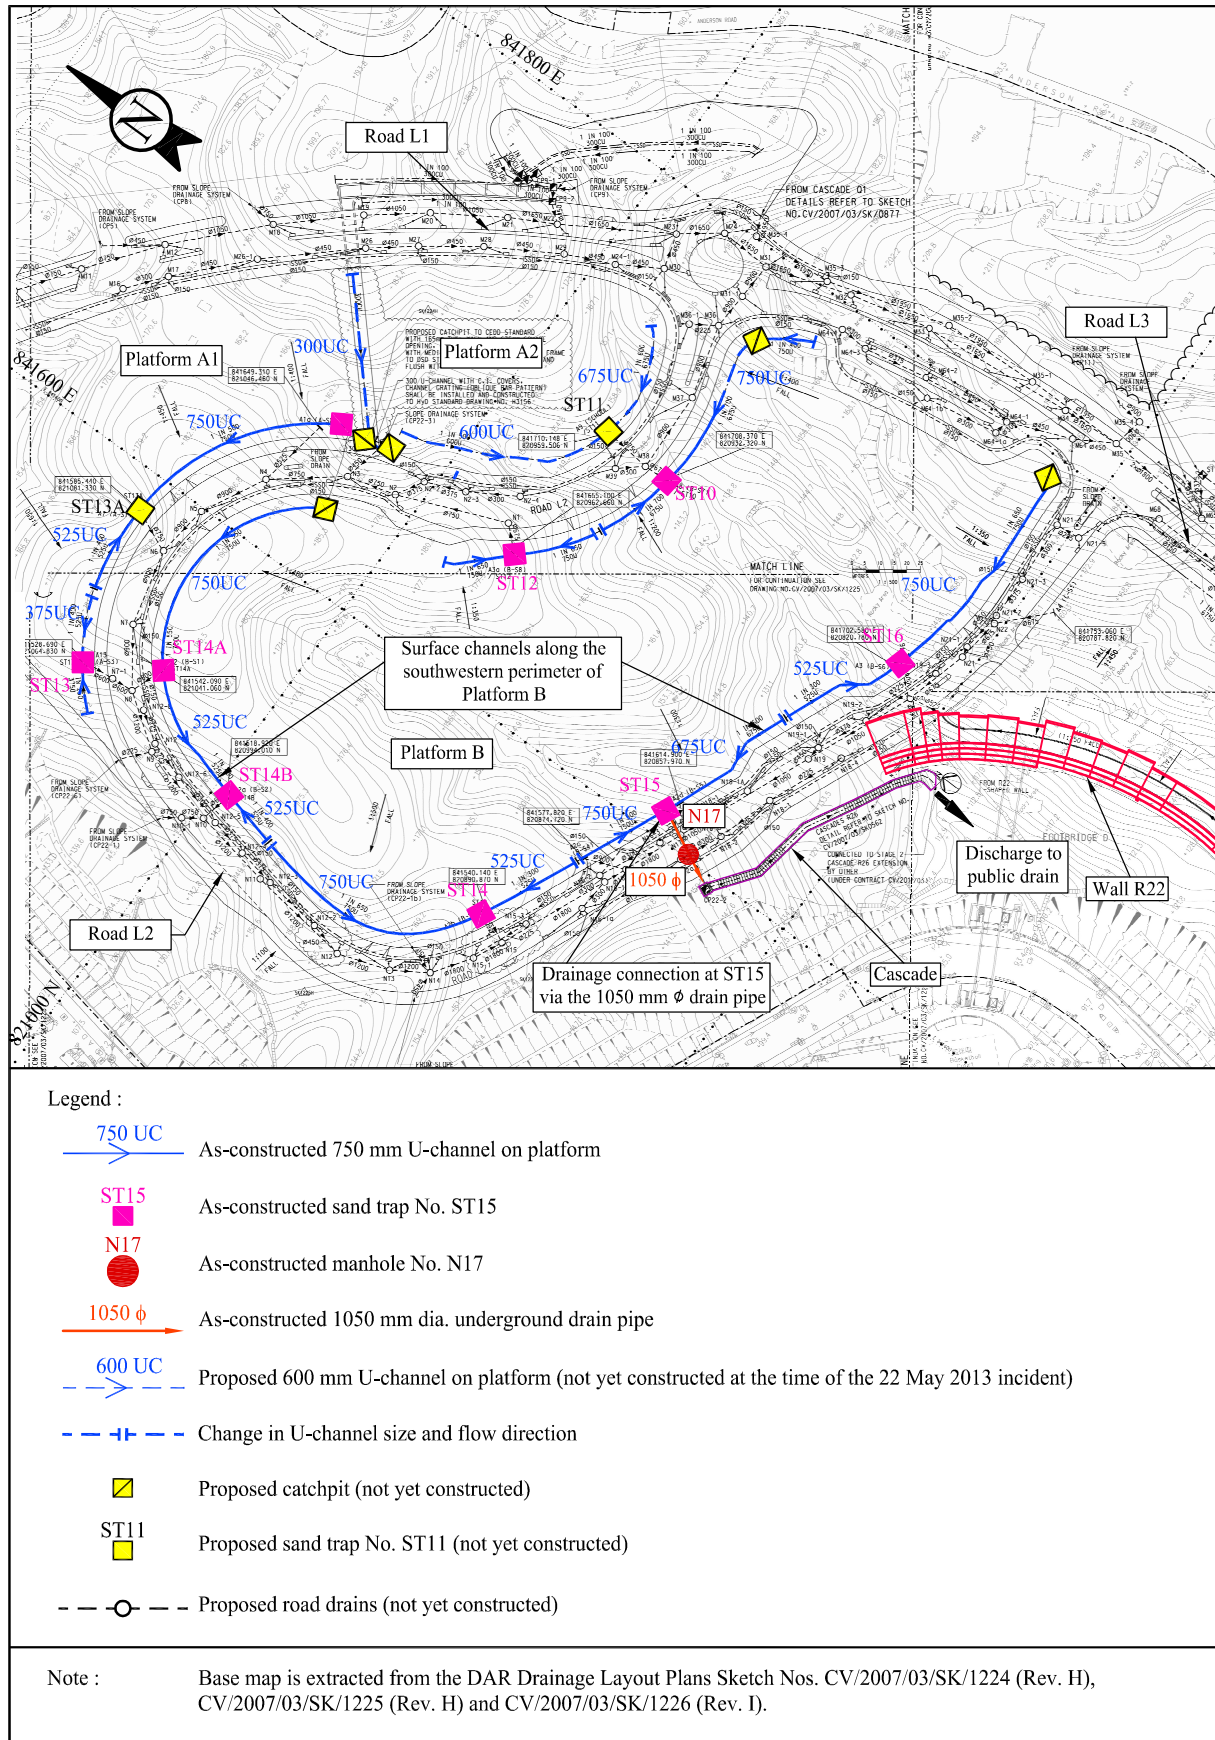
Layout Plan of Proposed Permanent Drainage Works
